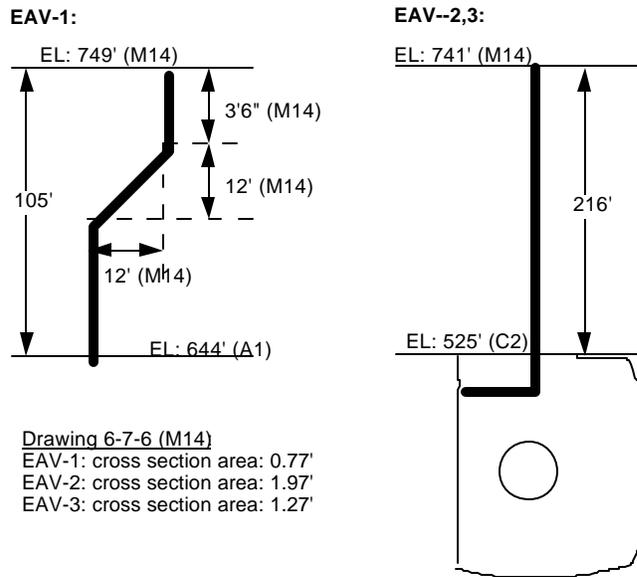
Schematic drawings of EAV1, 2 and 3 with dimensions.
